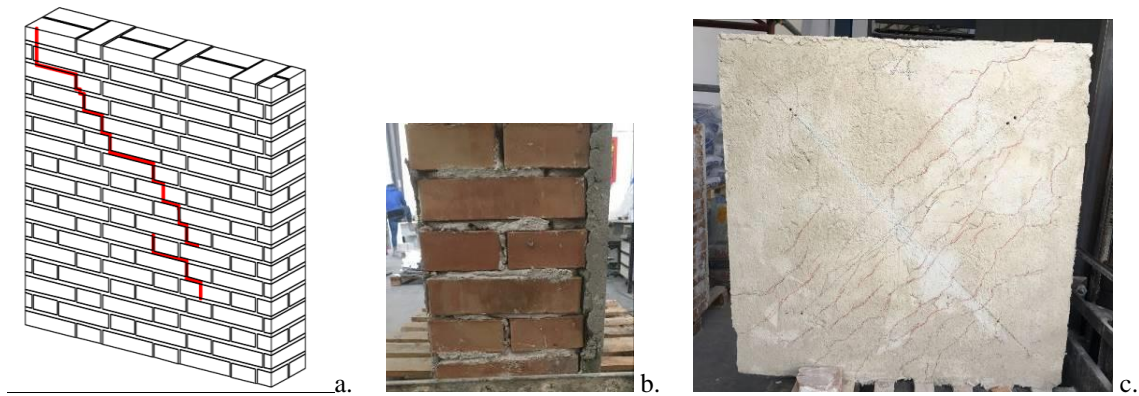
Failure modes: a. Unreinforced brickwork panel, b. Single-sided reinforced brickwork specimens, c. Shear cracks on the double-sided reinforced wall.
